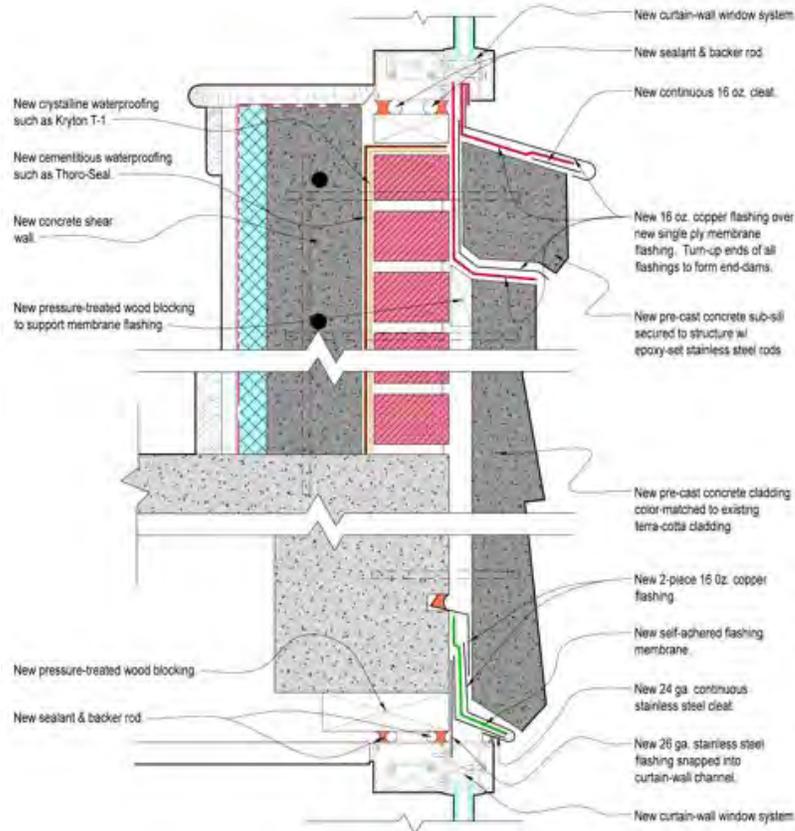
(3): Option 1 Restoration Approach at Typical Public Façade Windows
